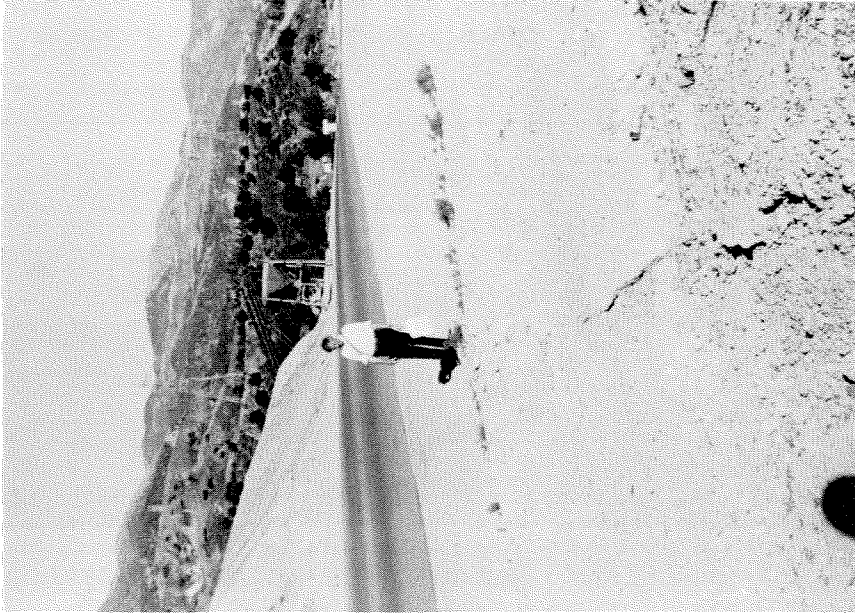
Looking northeast along a through-going crack in the area of the Golden State-Foothill freeway interchange.
